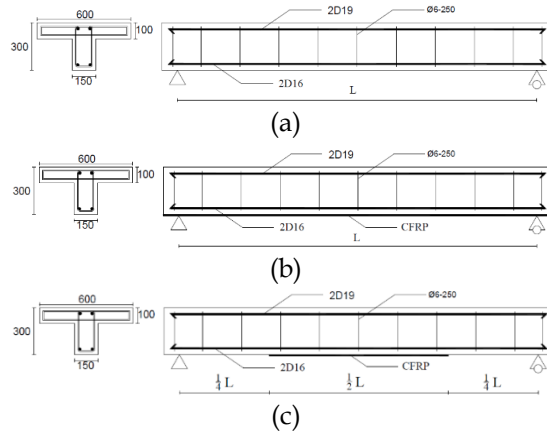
T-beam Specimens: (a) Control Beam, (b) T-beam with Reinforcement along The Span (B1), (c) T-beam with Reinforcement Half of The Span (B2)
